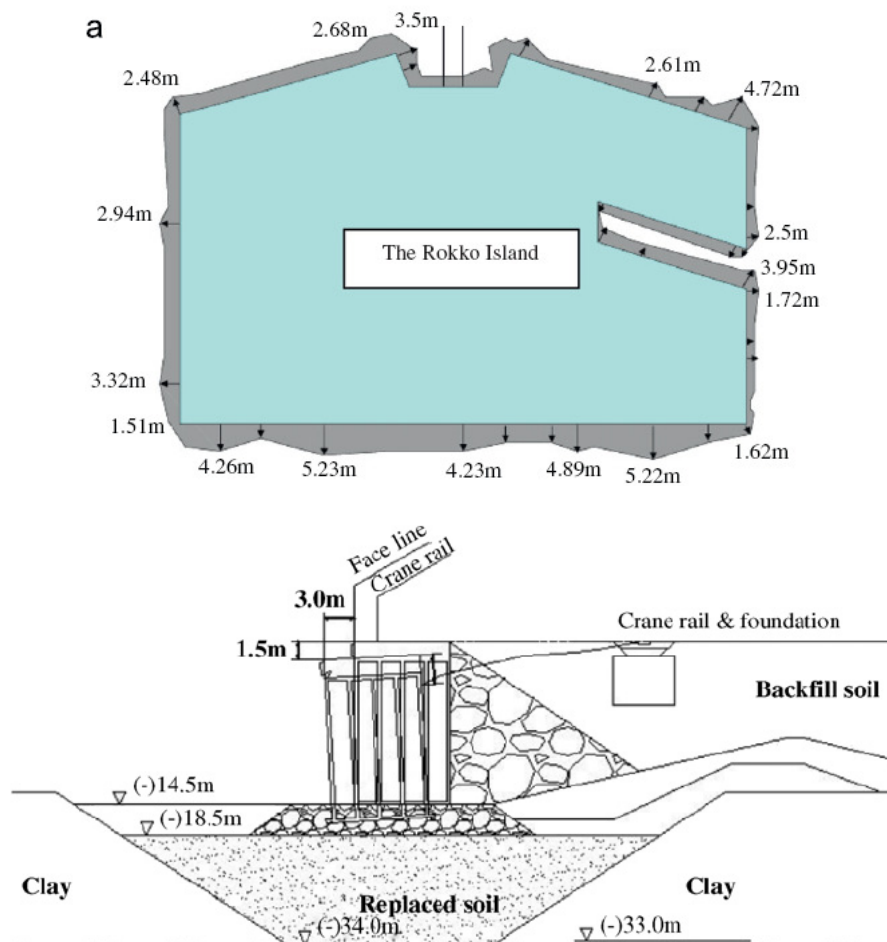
(a) Field observation of RHD for damaged quay walls at the Rokko Island in Kobe port and (b) typical damaged section of a quay wall
